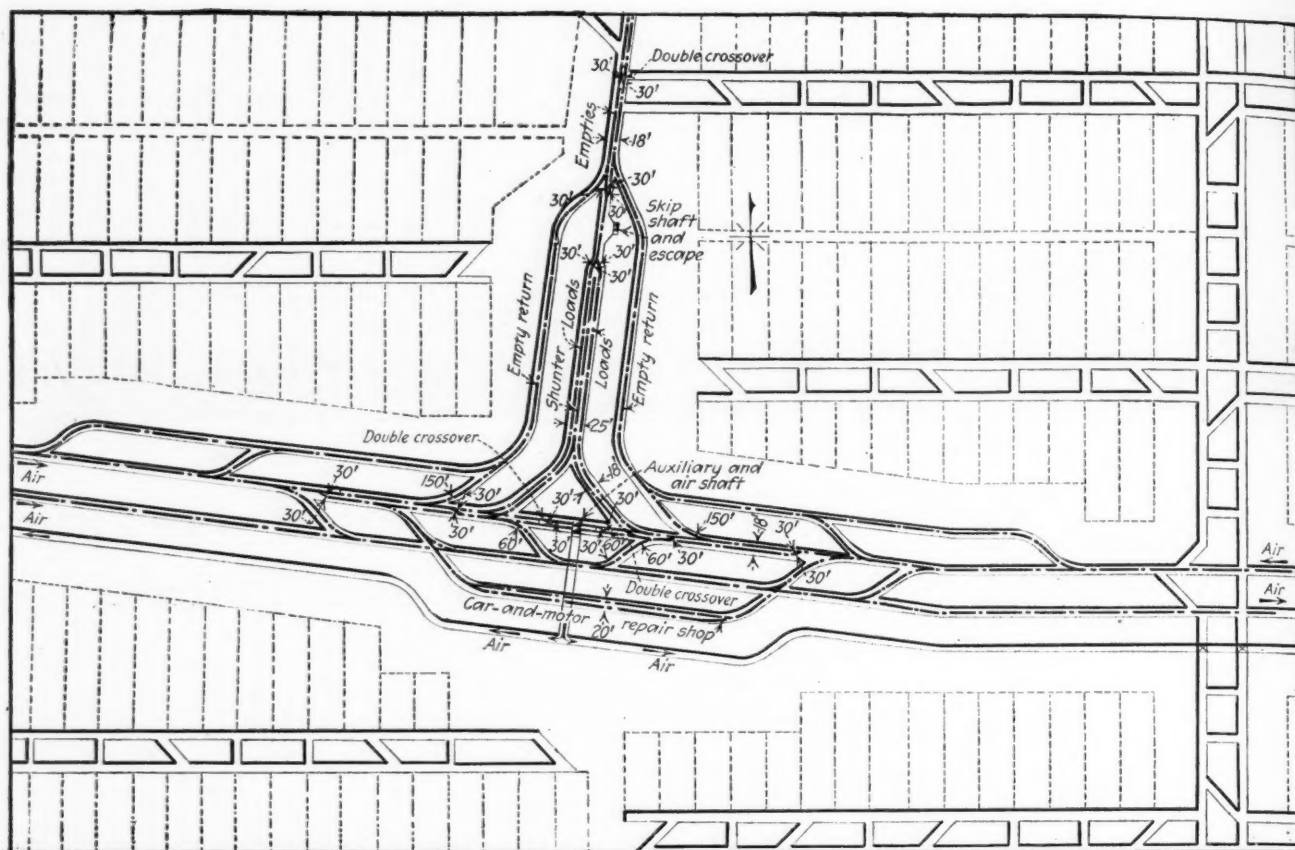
SHAFT BOTTOM LAID OUT FOR HOISTING BY TWO SHAFTS
